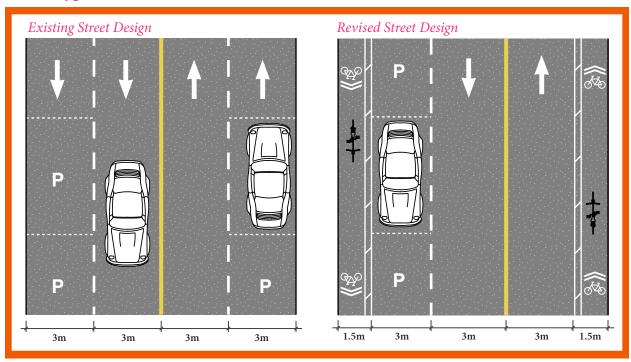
Street Design Revitalization; Street Type 1, plan
